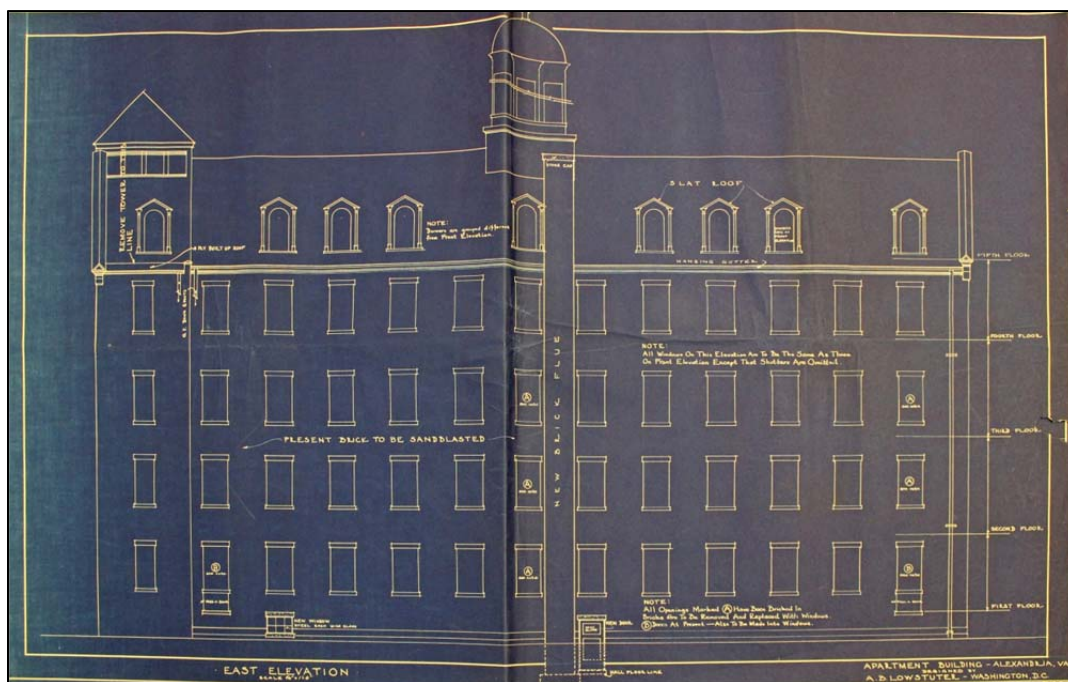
1935 A.B. Lowstuter's Design for Belle Haven Apartments. East Elevation. Courtesy of Alexandria Local History Special Collections. Drawing notes the installation of a new brick flue in the center of the elevation, a new window and door at basement level, windows to be converted into doors, spatial arrangement of dormer windows, and removal of height from the elevator tower.
